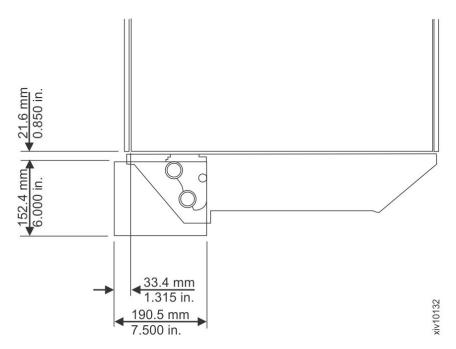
Raised-floor hose management example 2: tile cutout size and position
